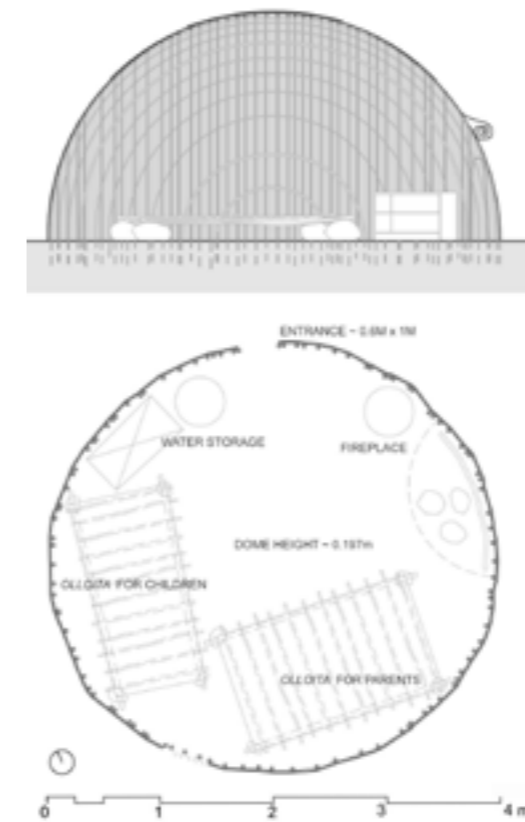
Plan and section of typical construction of an Afar Deboita house (Emilia Chocian 2012)
